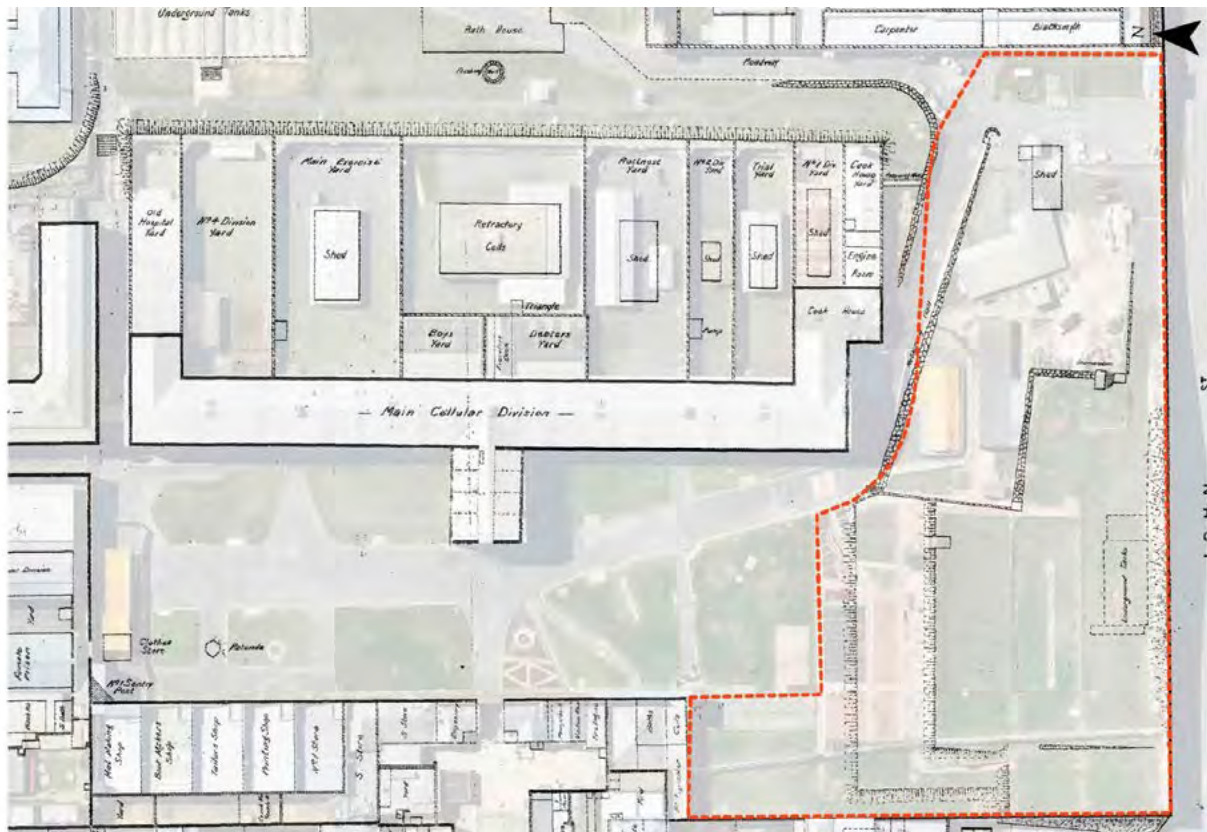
The plan from 1919 shows the location of the South Reservoir, labelled 'Underground Tanks'. The shed and incinerator are included in this plan, as well as the structural landscaping with some changes from previous plans.
